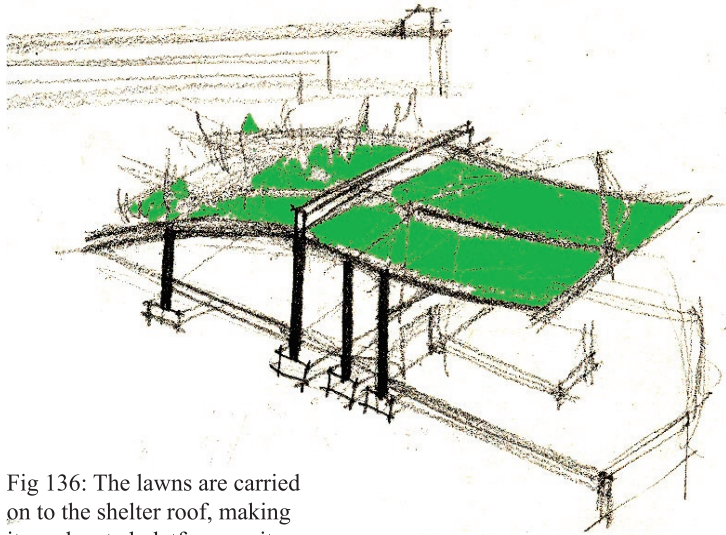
The lawns are carried on to the shelter roof, making it an elevated platform on its own
